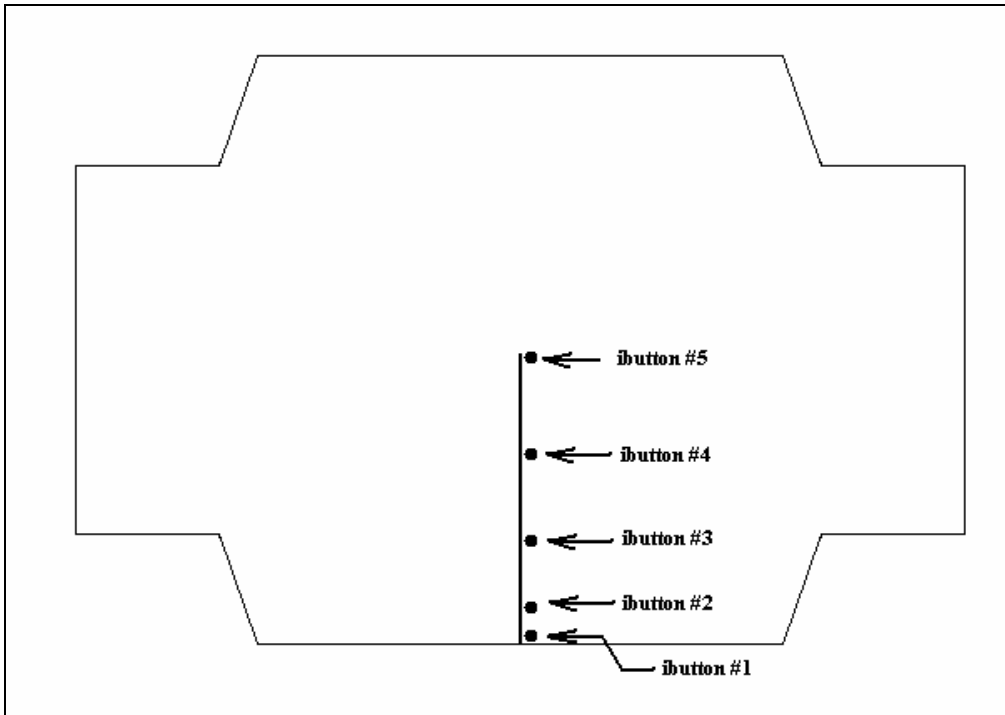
Plan view of column showing iButton runs K1 and J1 layout (not to scale)
